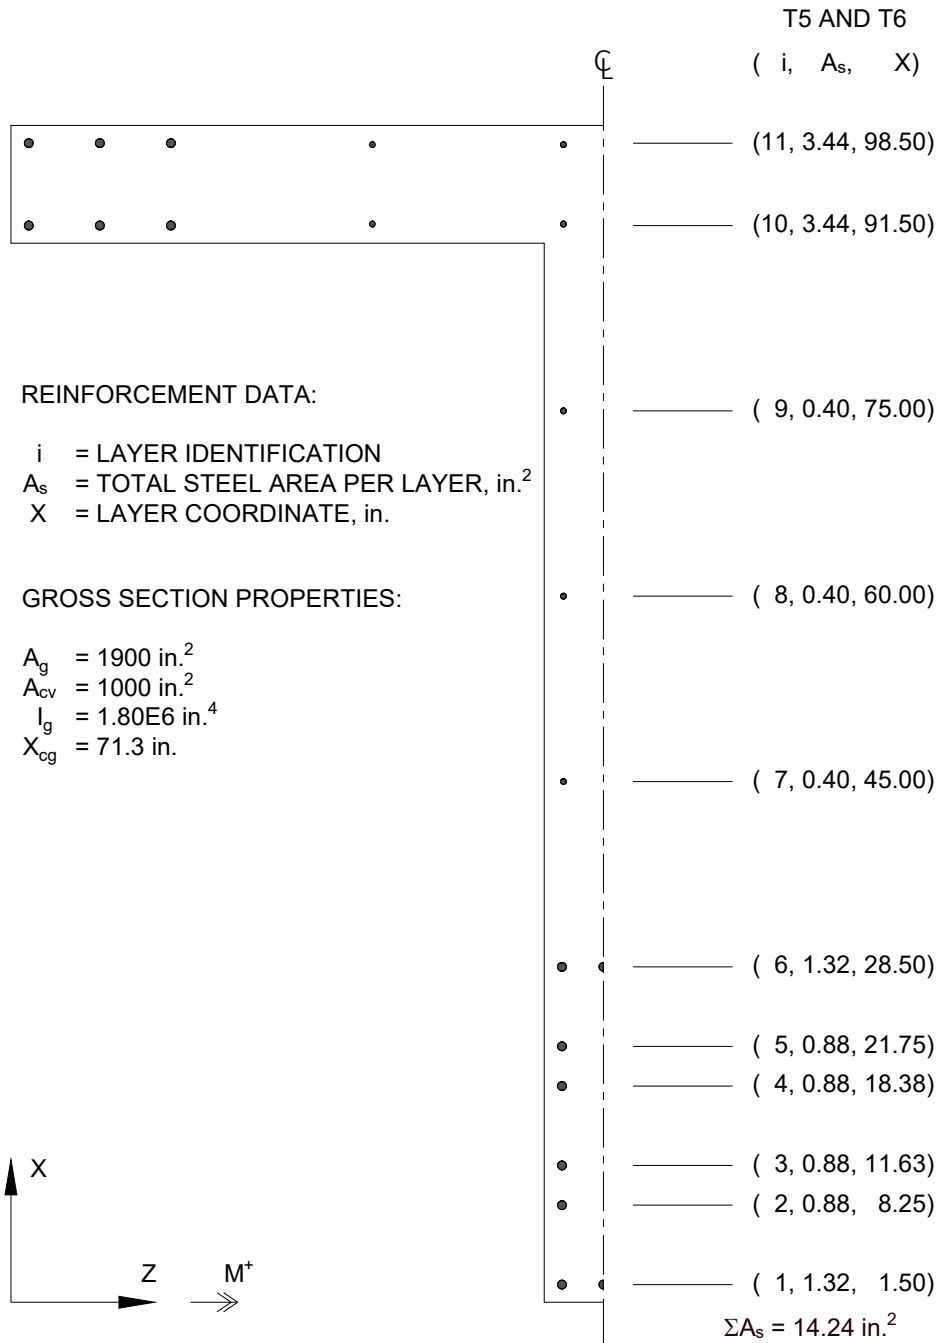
Reinforcement data and wall section properties (1 in. = 25.4 mm)
